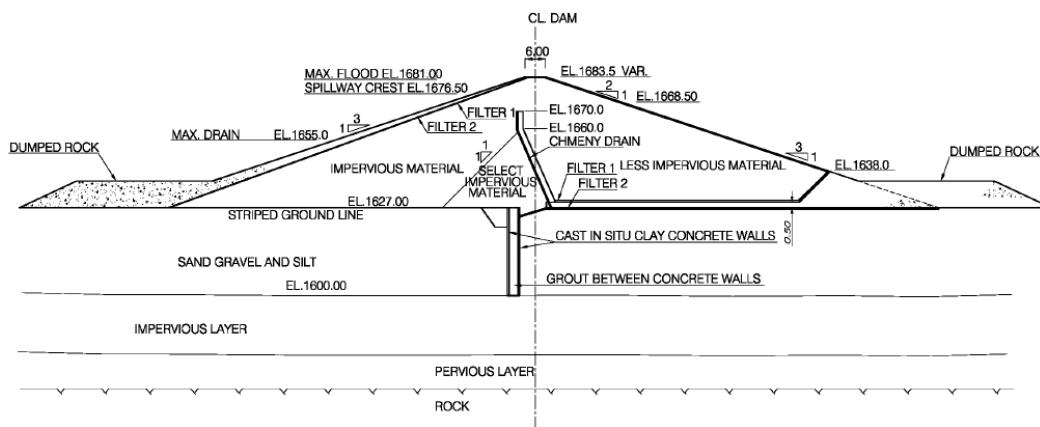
Cross Section A-A of Doroodzan Dam (the cross section is shown on Fig. 4)
